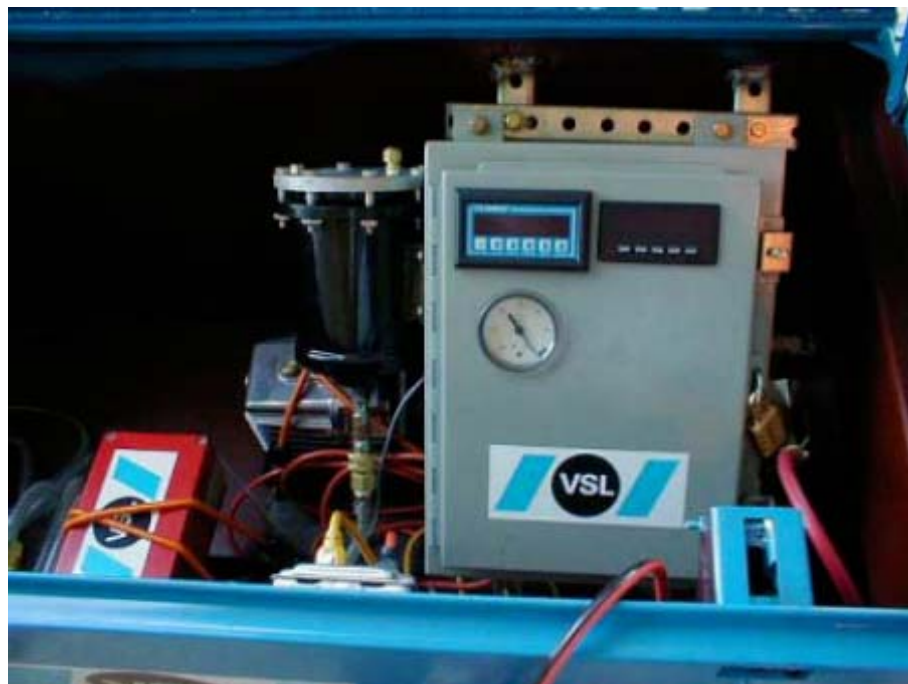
Vacuum Control and Grouting Equipment for Tendons with Defective Grouting (VSL 2002).
